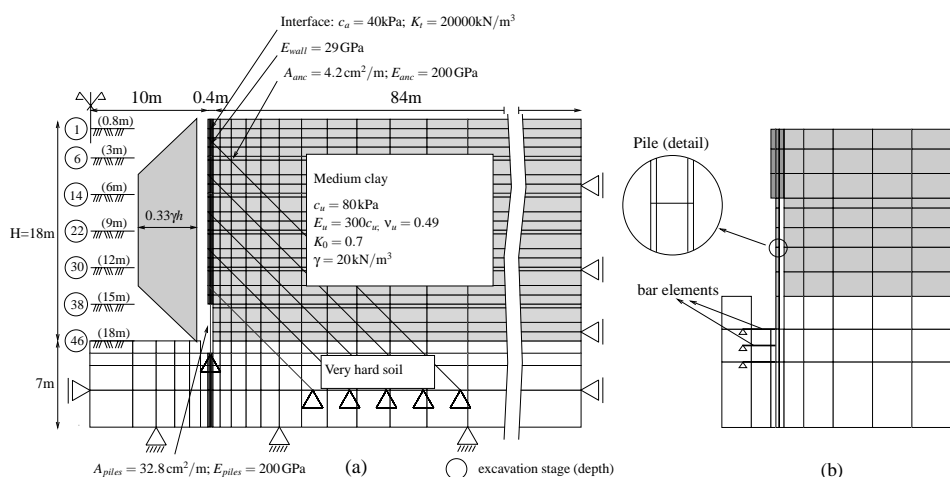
Geometry of the case study, material properties, finite element mesh at the last excavation stage (a) and detail of pile modelling (b).
